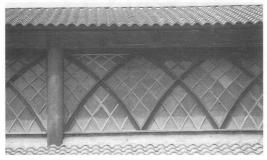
Clerestory trussing of the Sayn Foundry, 1830, showing connections between the panels instead of between the ribs (photograph T. F. Peters)
